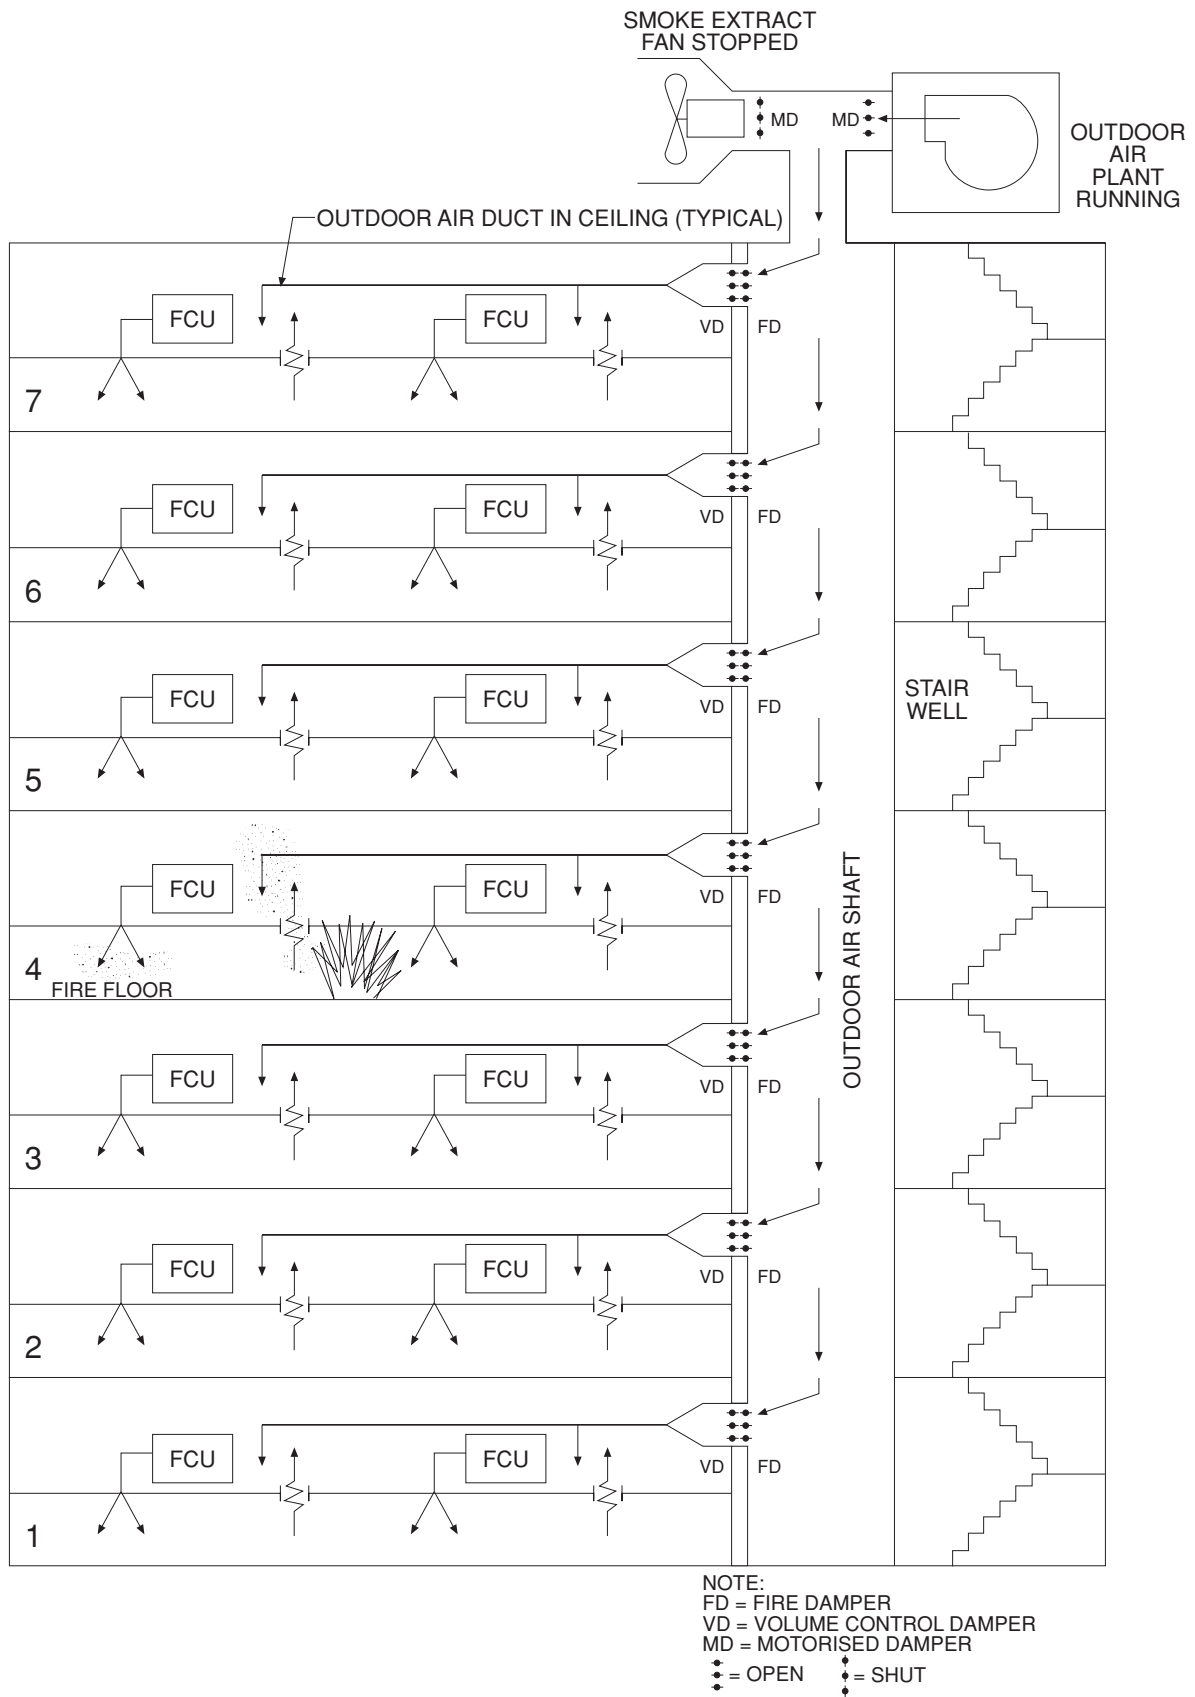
Typical floor-by-floor HVAC, fan coils
